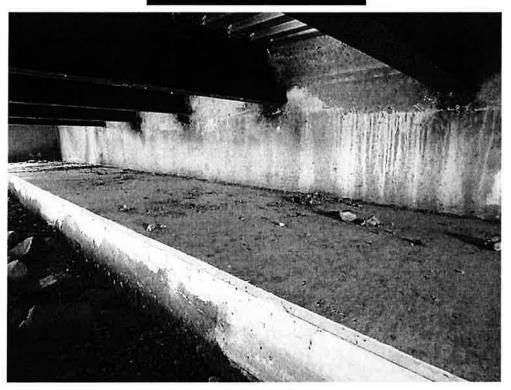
East abutment breastwall and backwall - scattered hairline cracks and efflorescence at the stringer ends.
